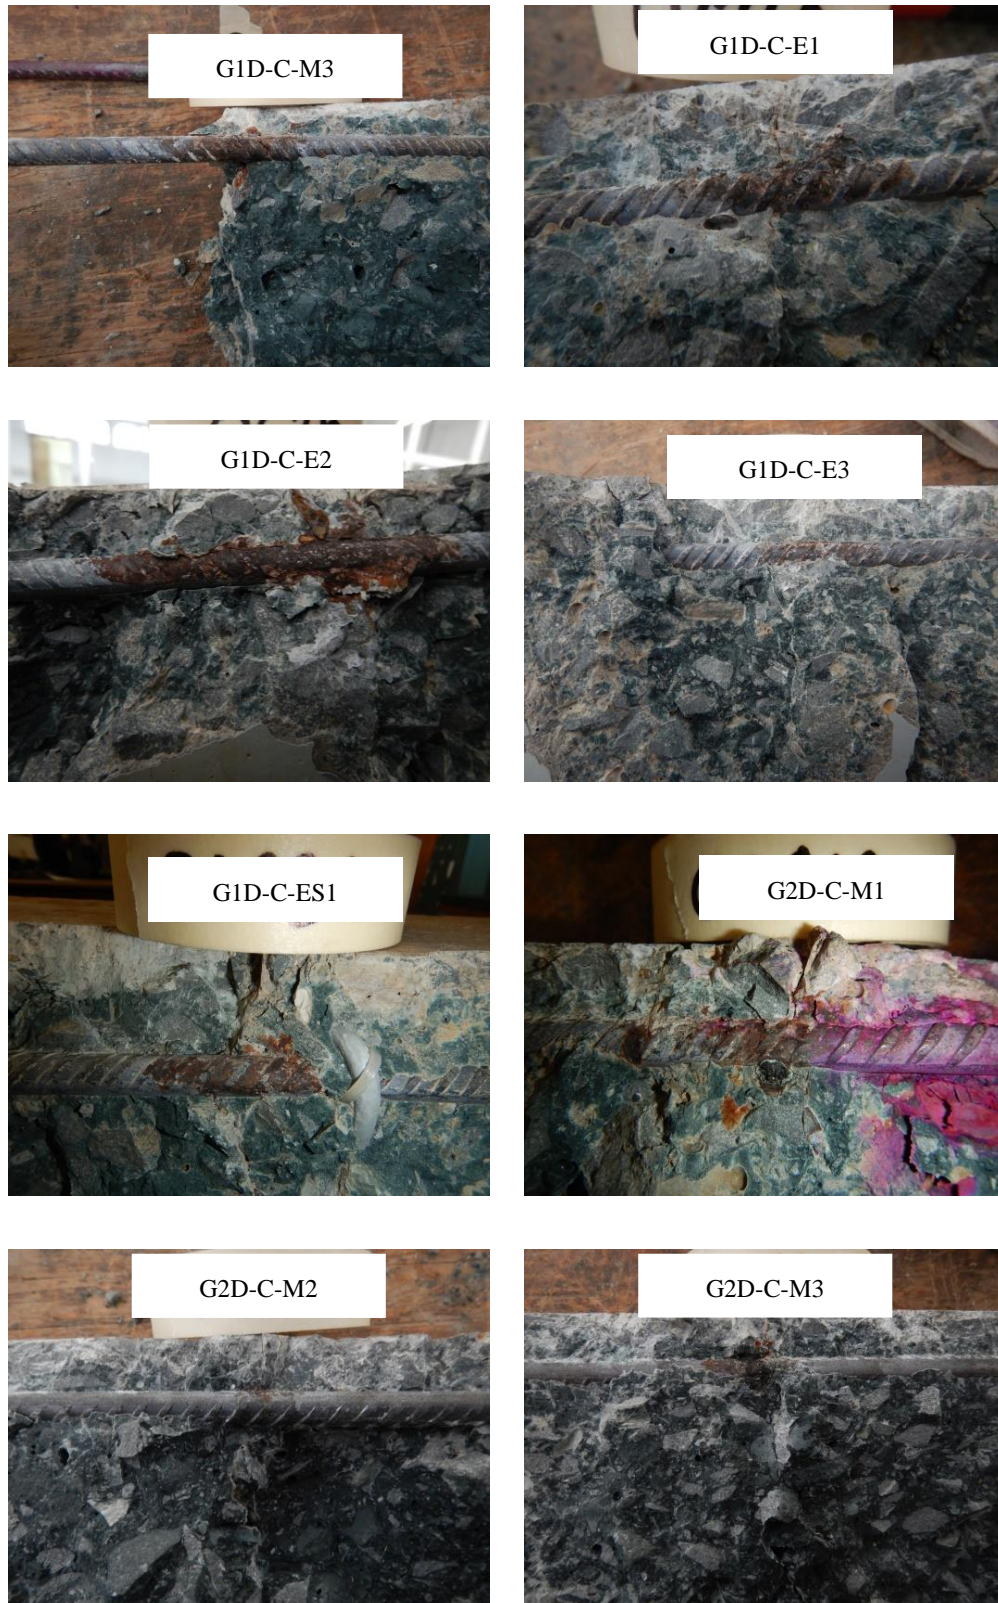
Photographs of corroded reinforcement bars in cracked PC/SL concrete (contd.)
